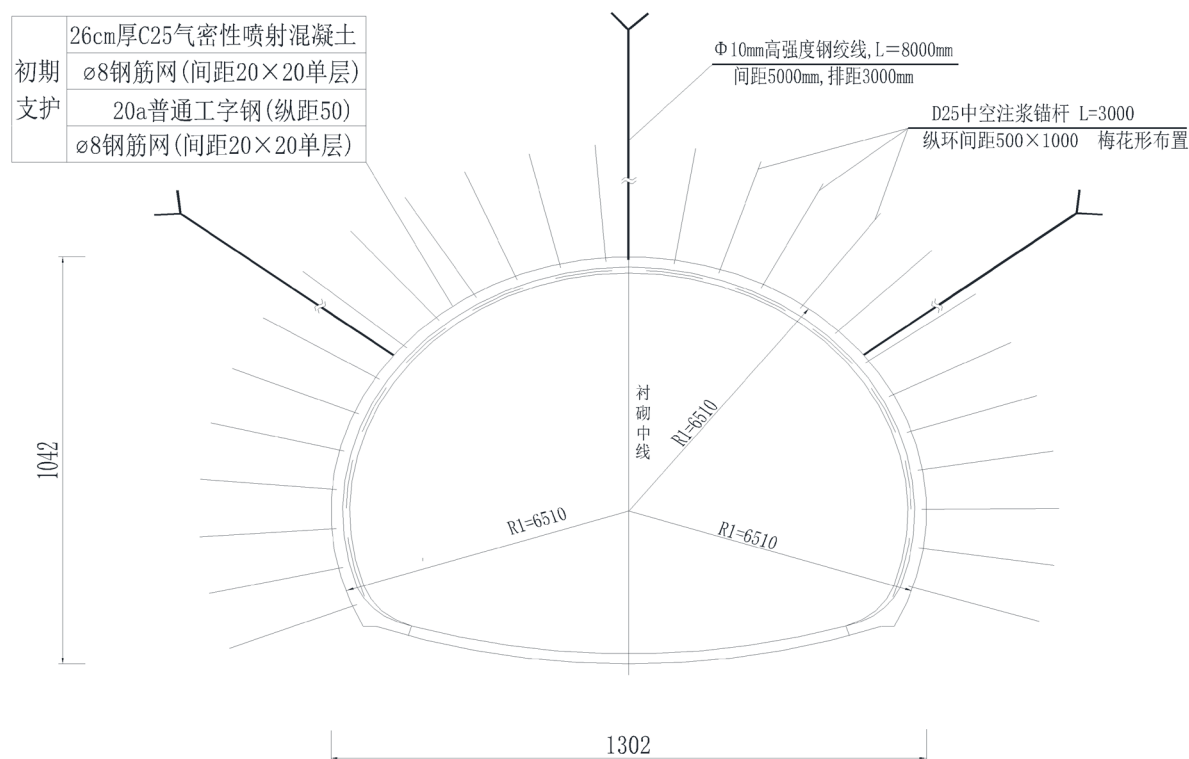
Reinforcement drawing of the anchorage cable in the area of tunnel uncovering coal
